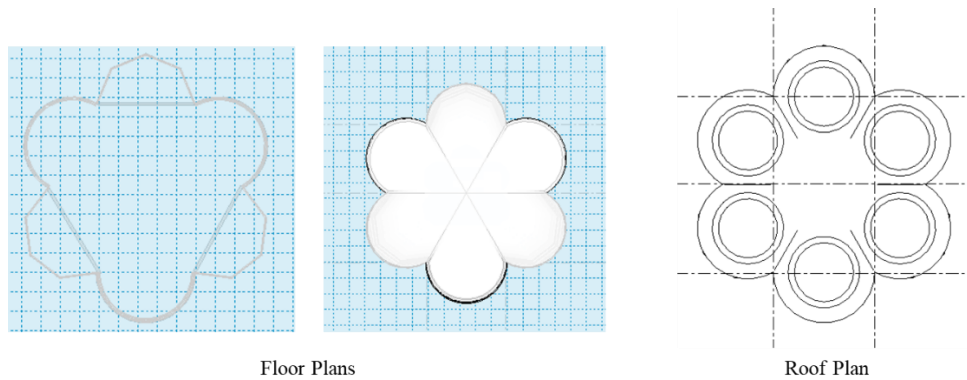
Biomimicry inspired building model: Floor plans and the roof plan views of the building
